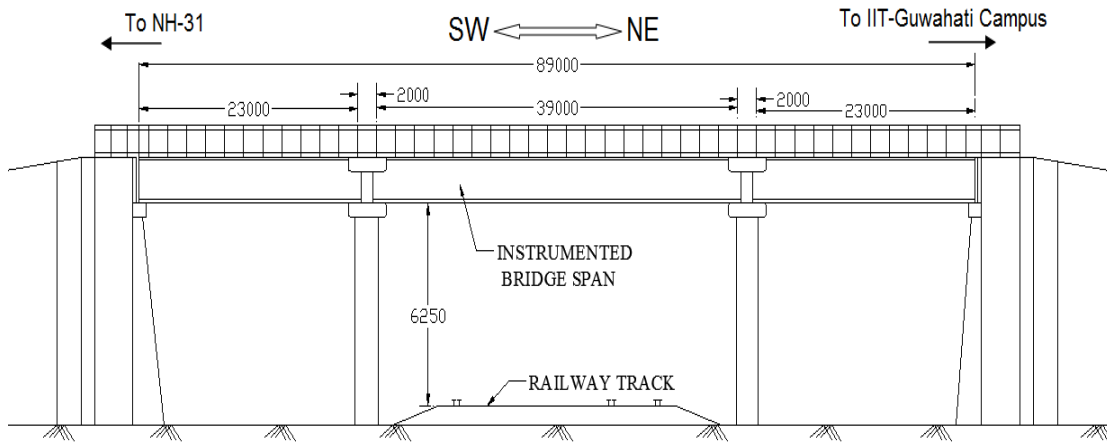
Elevation of the tested bridge (All dimensions are in mm)
